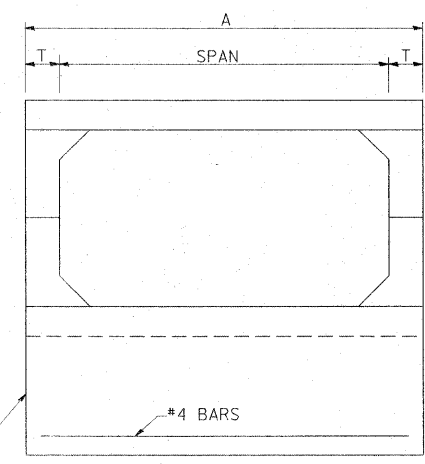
DETAIL OF PRECAST CONCRETE BOX CULVERT END SECTION
